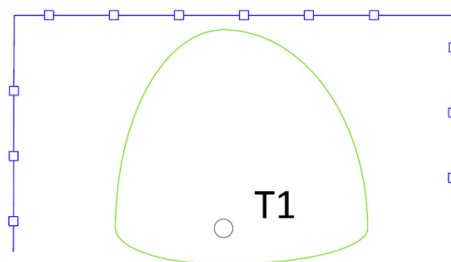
Figure A: An example of how tree protective fencing is shown on the tree protection plan.
